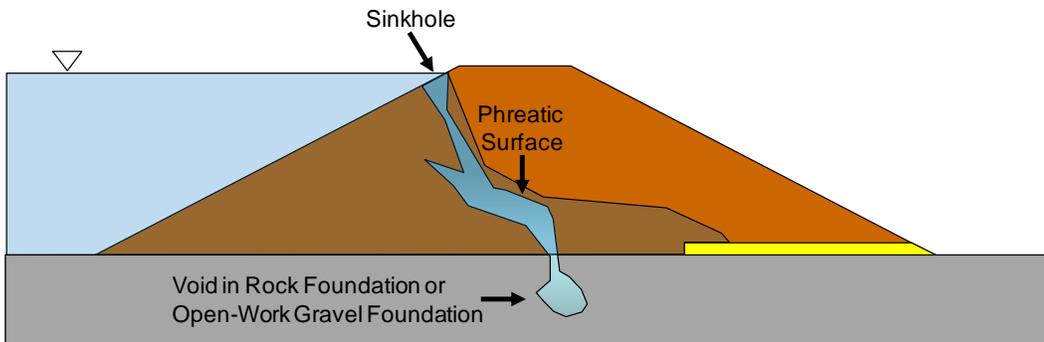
Internal Erosion of the Embankment into the Foundation
